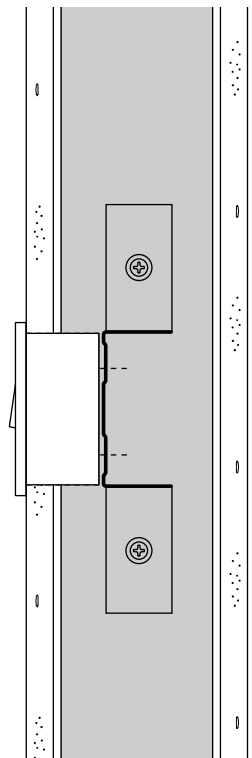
Gypframe Control Joint in a double boarded GypWall partition
